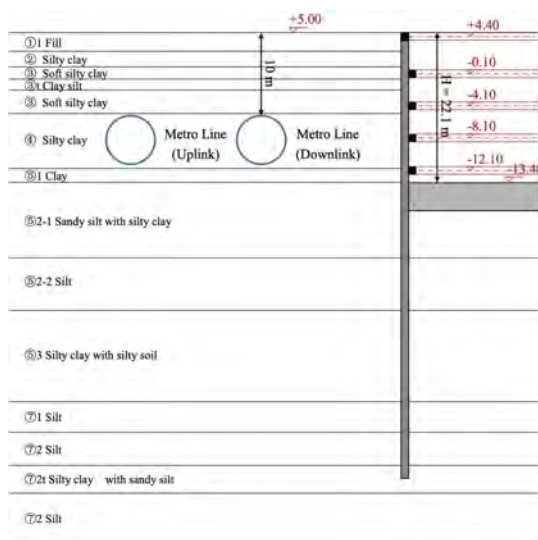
Profiles of the foundation pit excavation and existing tunnels.
